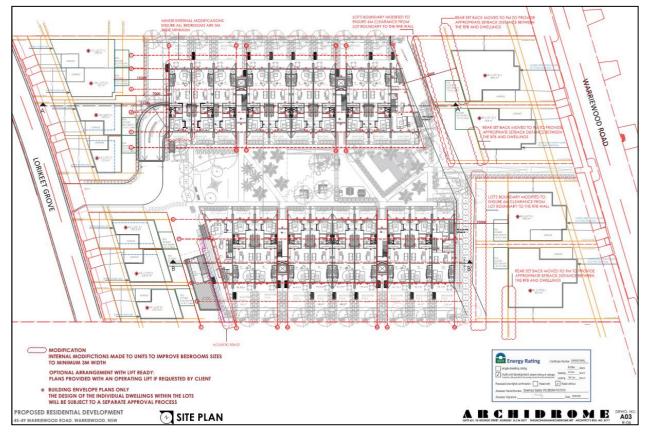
Site Plan - The Report will assess the Class 2 building in the central part of the site and exclude the dwellings fronting Warriewood Road and Lorikeet Grove.
